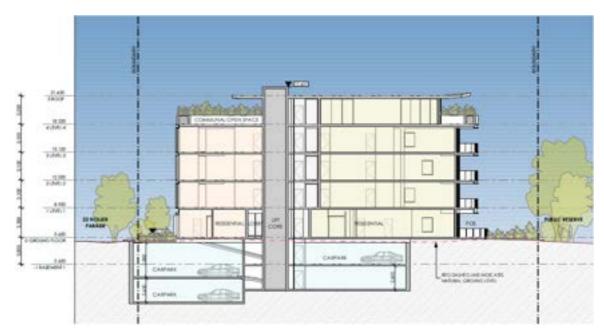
Elevation of 22 Noller Parade, Parramatta from the east
